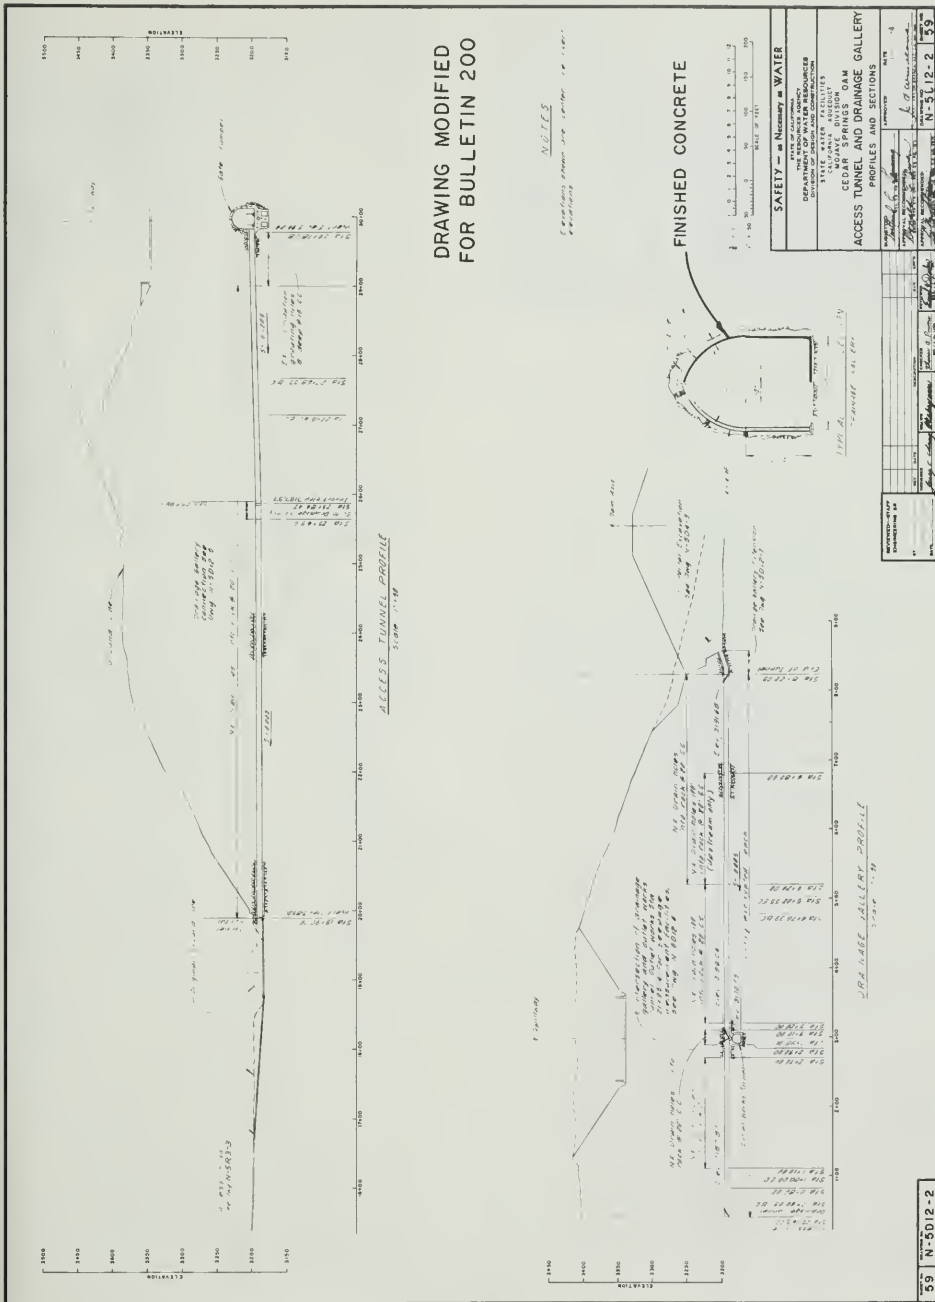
Access Tunnel and Drainage Gallery—Profiles and Sections
